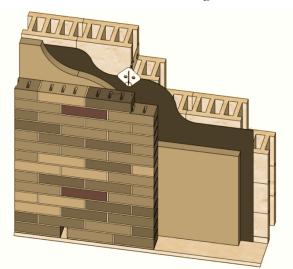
Traditional brick wall systems (picture redrawn from ICE et al. 2019)
